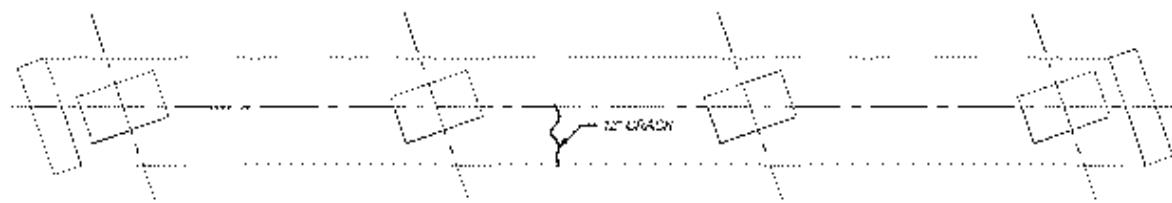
Location of Proposed Concrete Repairs - Forward (North) Abutment Plan MP 182.1
